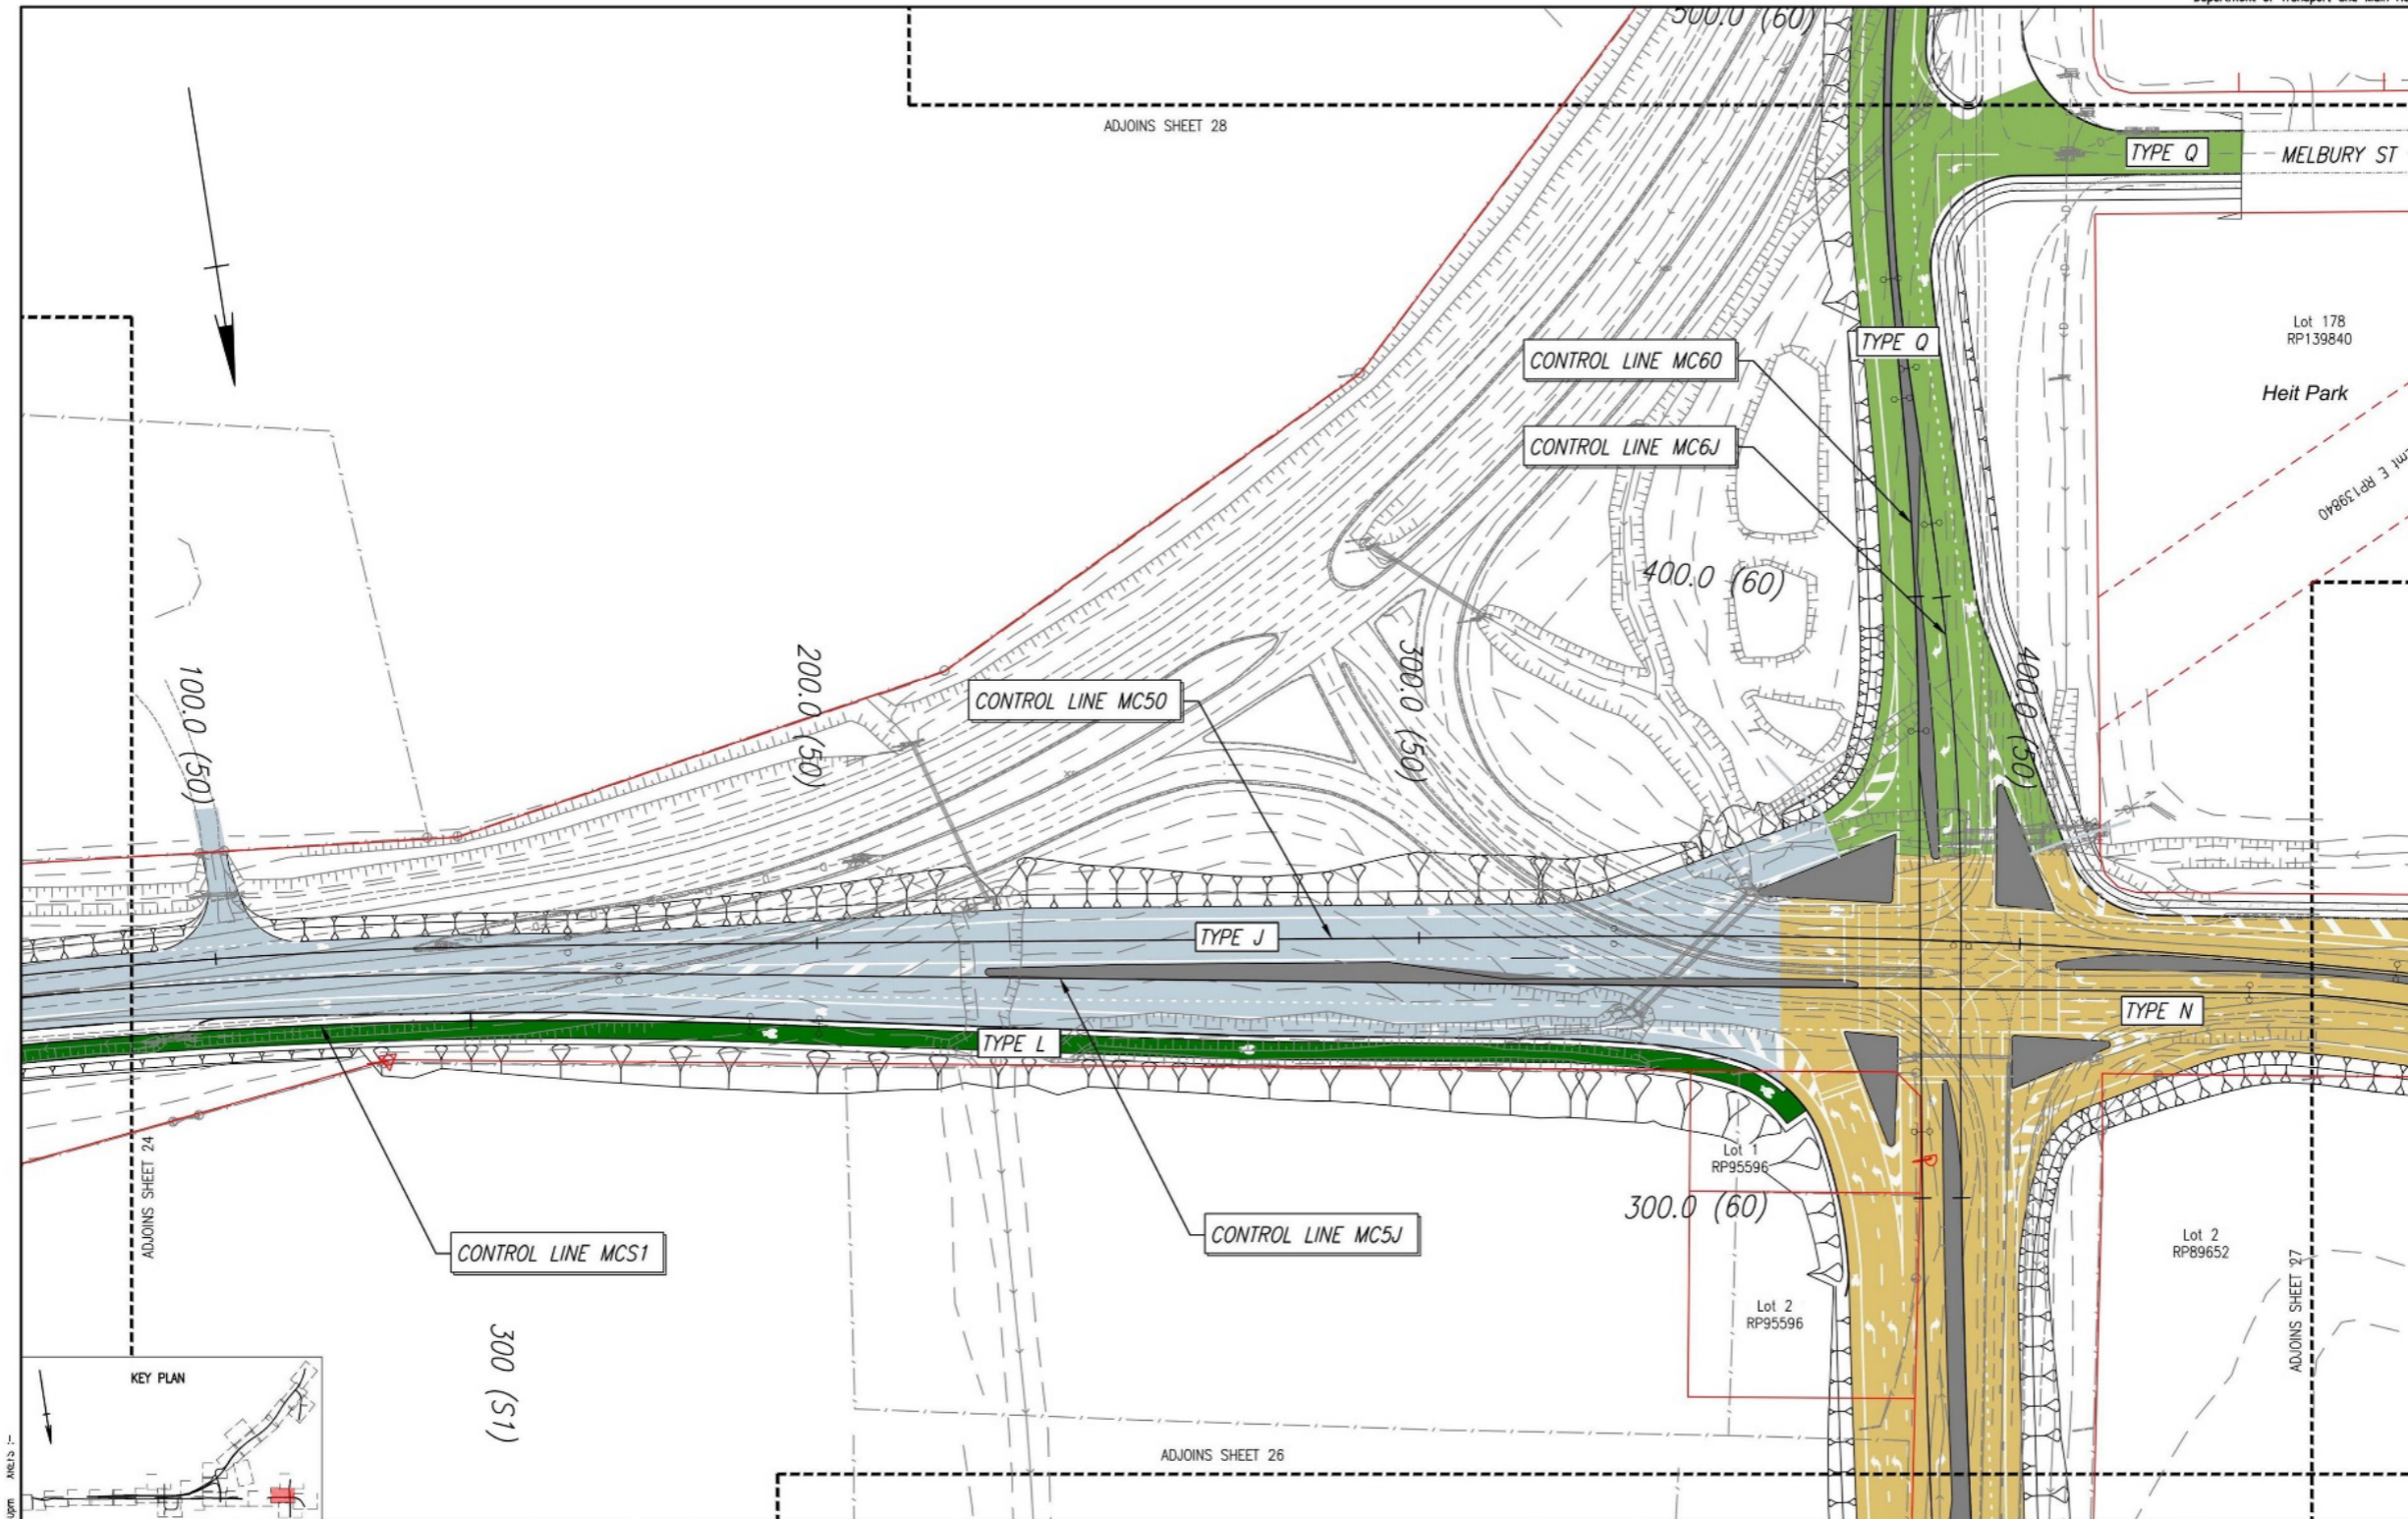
(e) – Pavement details – generic example 4 – sheet 2 of 2
